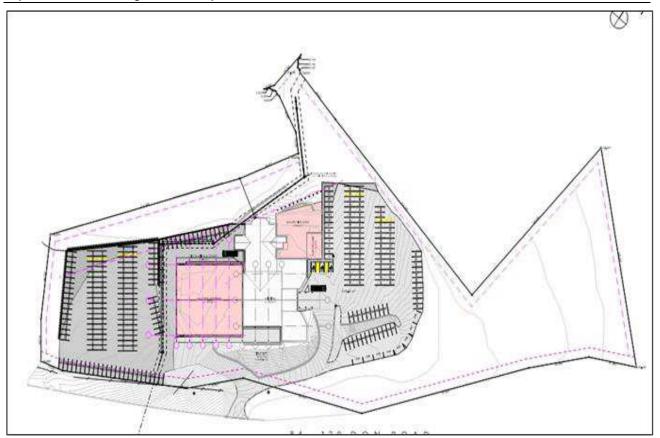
Site Plan of church redevelopment (Andrew Smith Architects, 2017)
